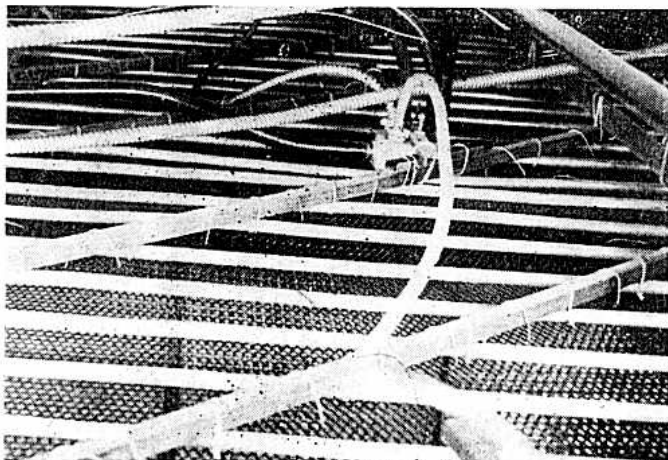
View looking down above the hung ceiling showing angles, channels, and copper tube.
